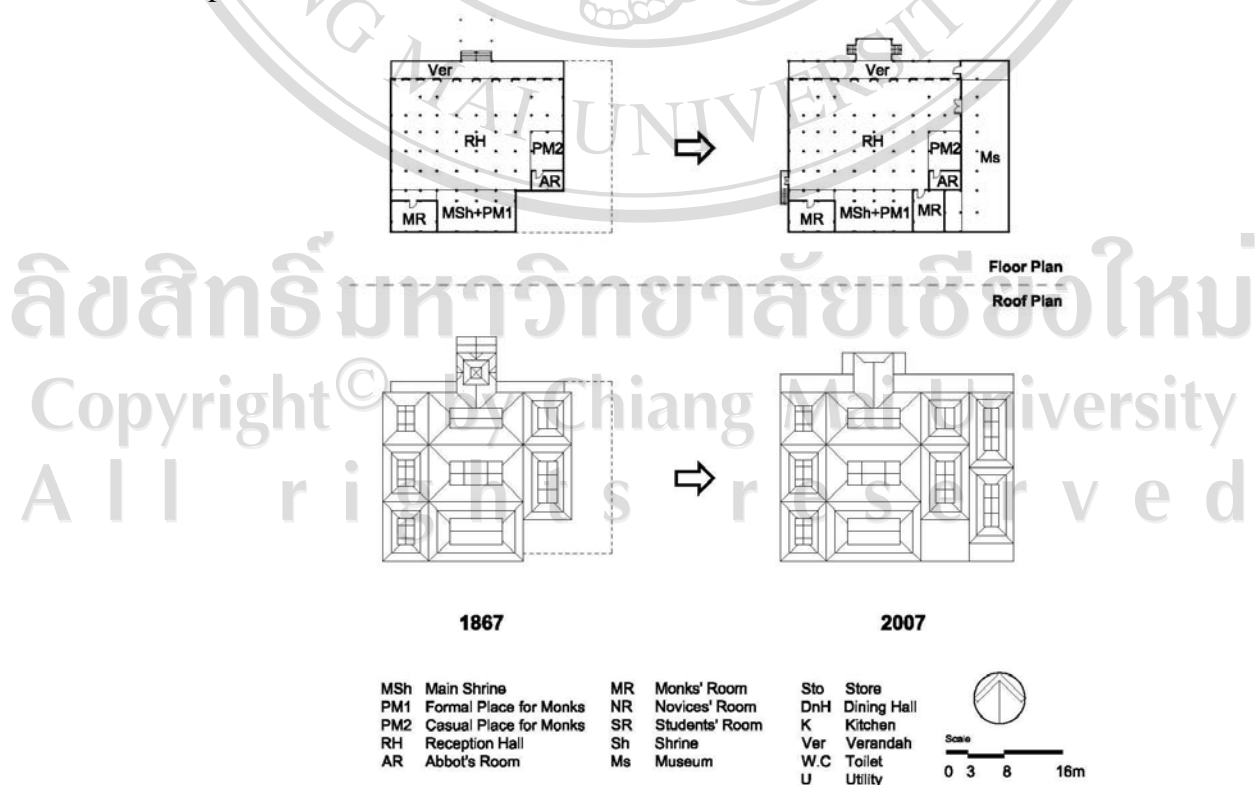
Spatial Transformation in Main Monastery Building of Wat Chong Klang
